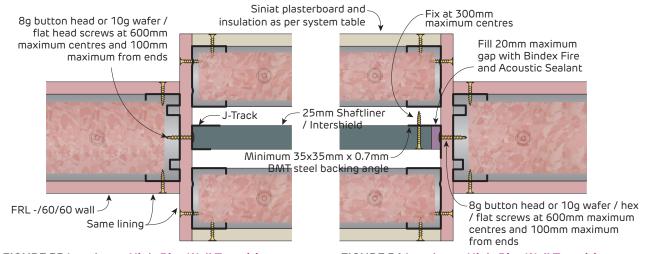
Interhome High-Rise Wall Transition to Single Stud Fire Rated Plasterboard Wall
